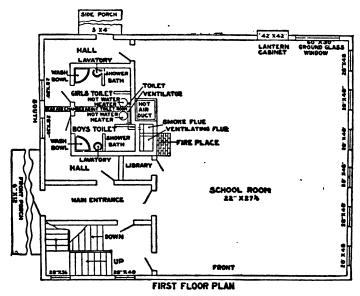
Floor Plan of the Demonstration Rural School of the First District Normal School at Kirksville, Missouri.
